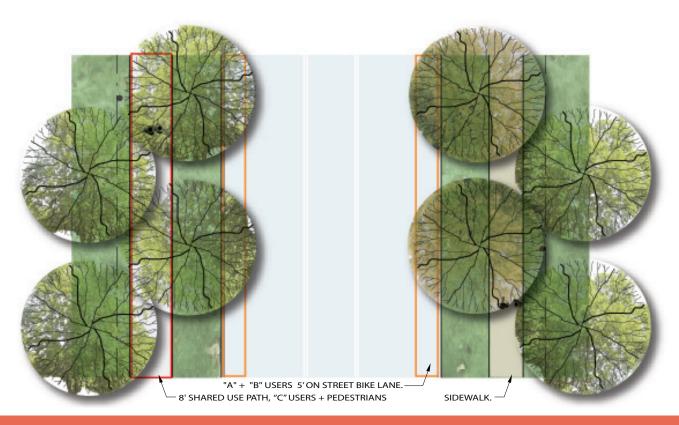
Eastern Parkway: Zone 2 Prototypical Plan - Bardstown Road to Baxter Avenue
